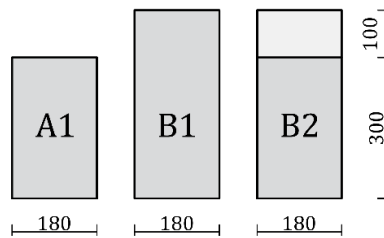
Cross-section types of the rectangular specimens with web reinforcement (dimensions: mm).
